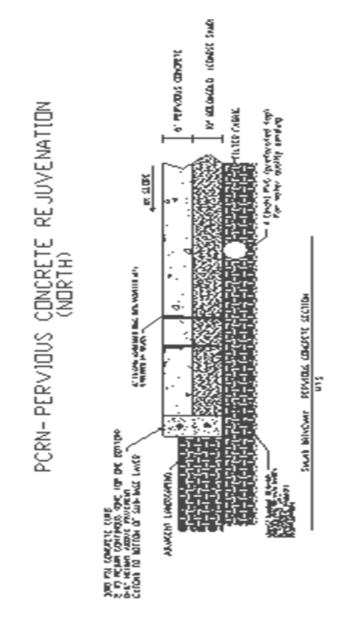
Cross-sectional view of Pervious Concrete Rejuvenation (PCR)
